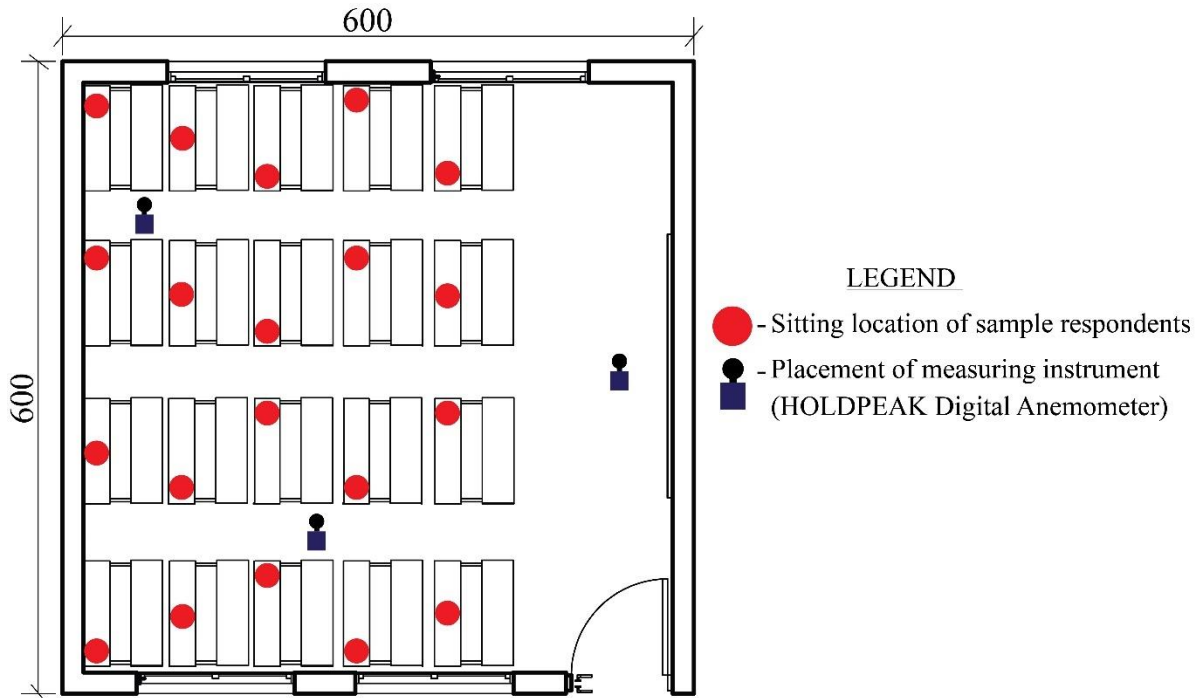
2 Sample Classroom layout, sitting location of respondents, and placement of measuring instrument (Source: Author, 2024)
